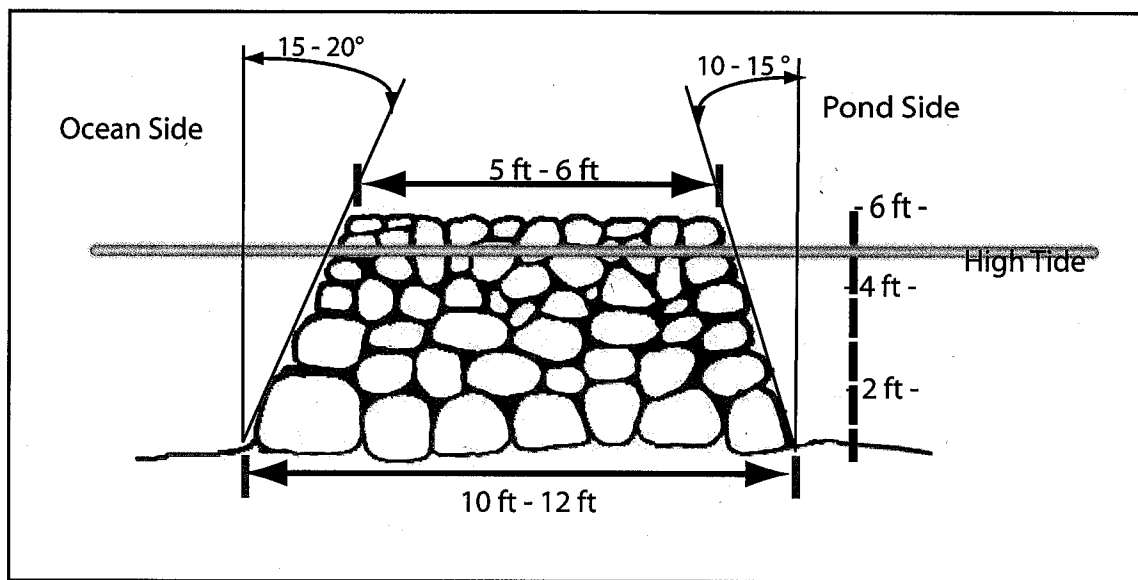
Kapoho Fishpond . Cross-section of Restored Wall.
